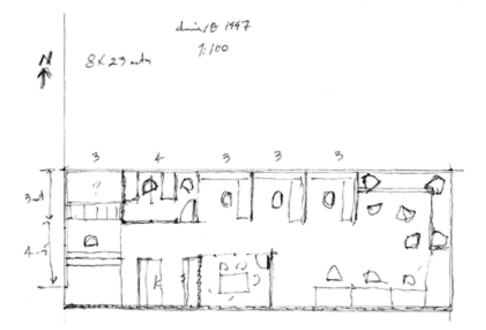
Mario's floor plan for Task 1 – he used detail furniture arrangement to test how the space would work.
